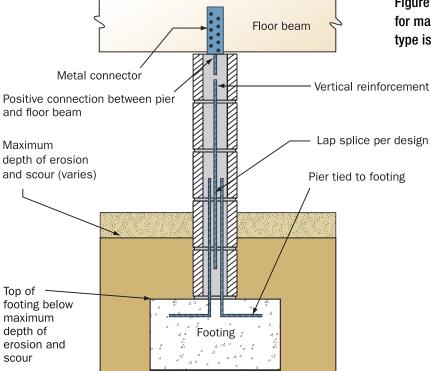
Recommended design details for masonry piers where this foundation type is appropriate
